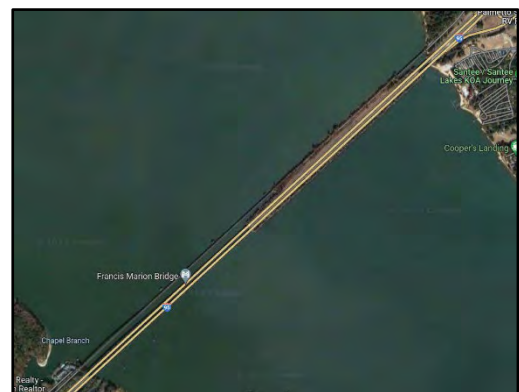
NB I-95 over Lake Marion Bridge Replacement in Clarendon & Orangeburg Counties,
